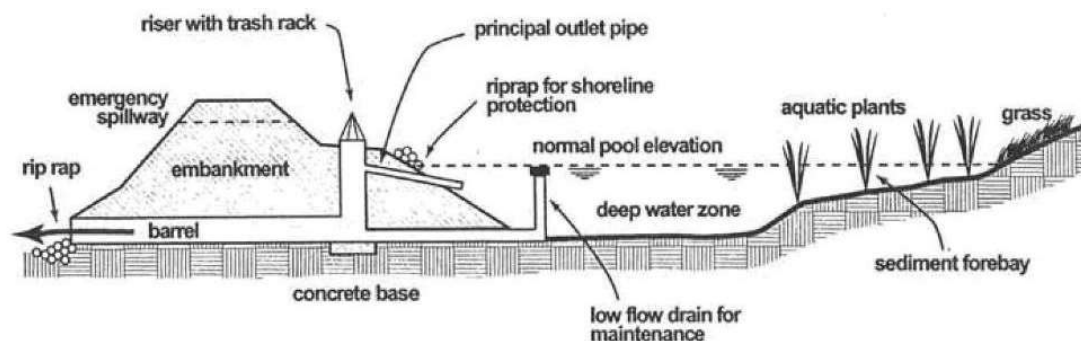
Retention Pond Schematic (Stormwater Pond Design, Construction and Sedimentation, 2020)
